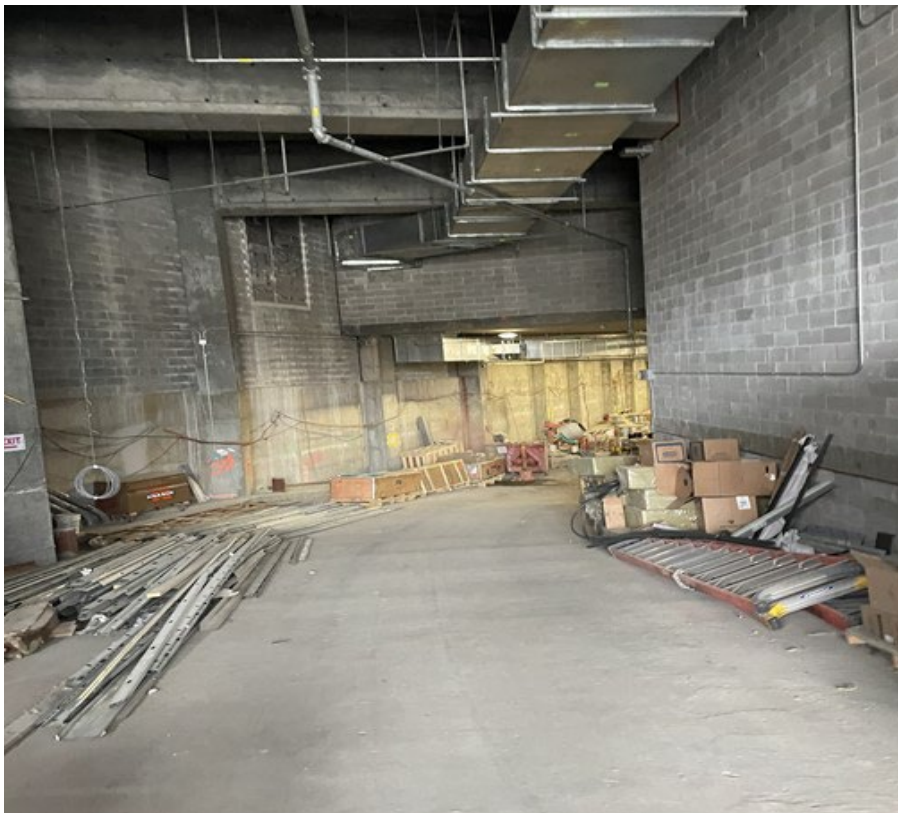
Photo of the cellar entrance hallway from Second Street (looking southwest).
